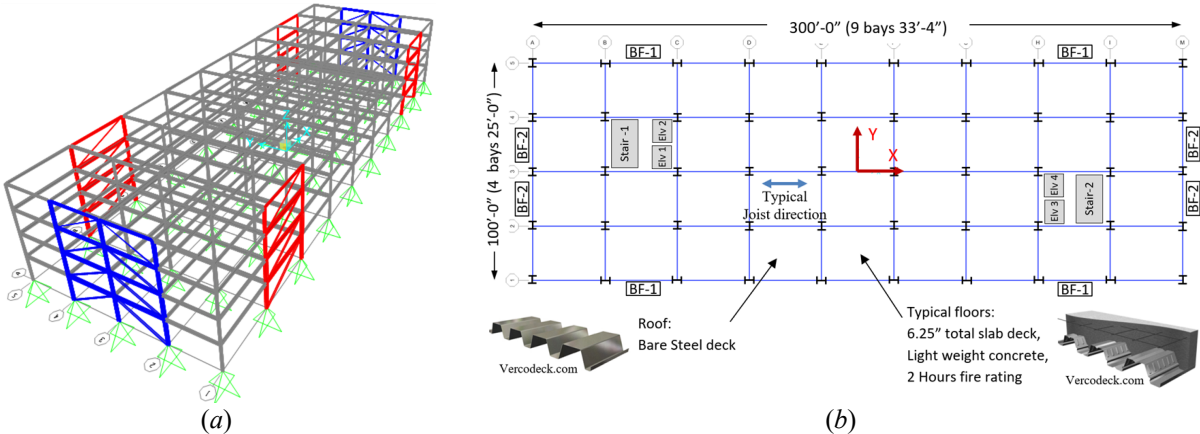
Schematic view of four-story archetype building: (a) 3D model, (b) typical plan
